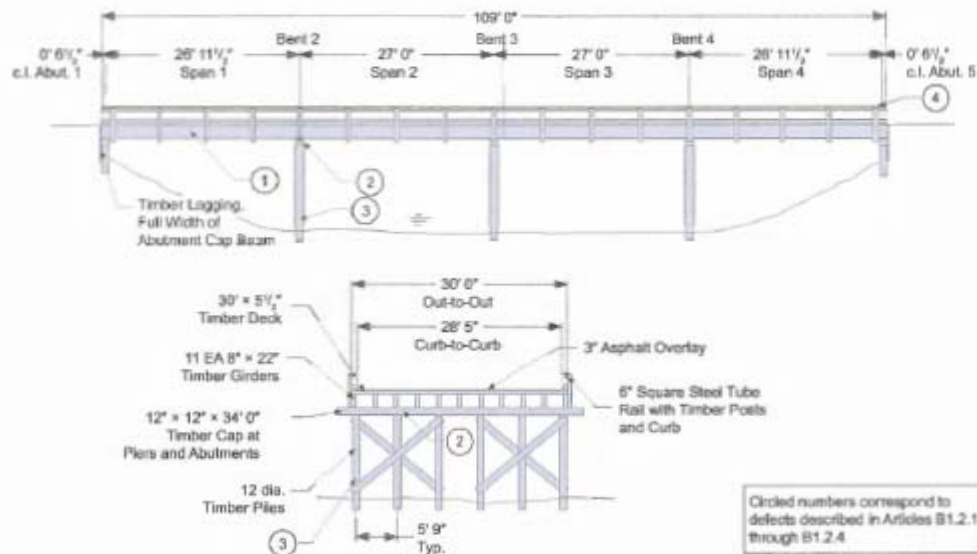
Elevation and Typical Section of Bridge for Timber Bridge Example
